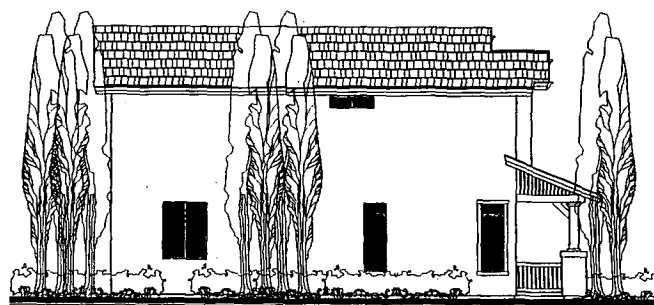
M - Plan 1 - Elevations and Floor Plans
